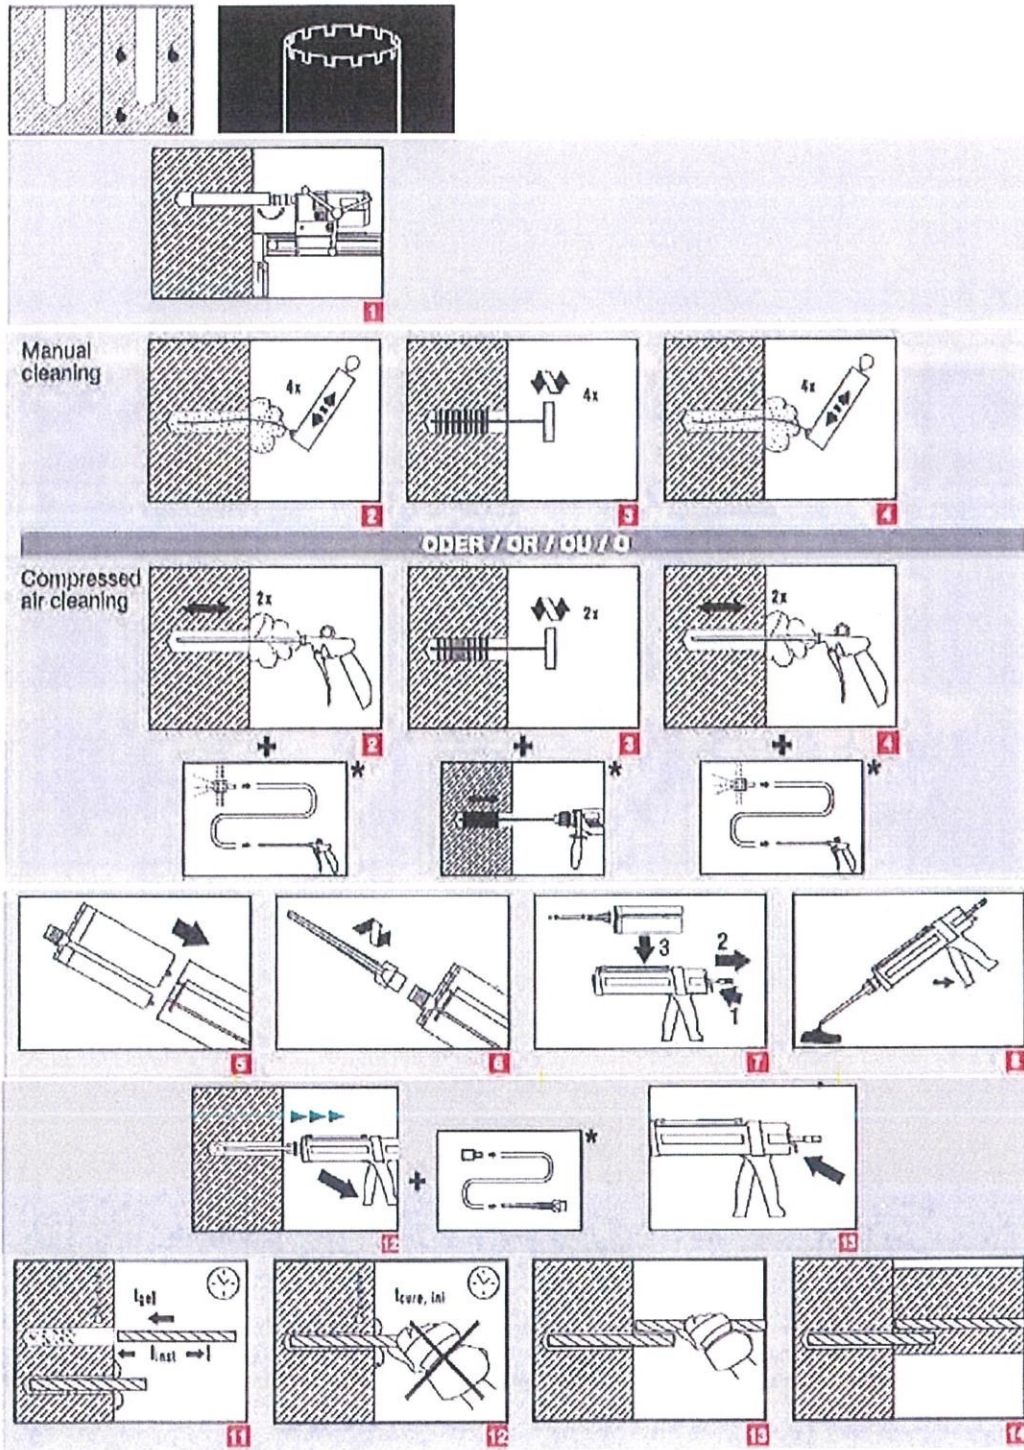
Dry and water-saturated concrete diamond coring drilling
